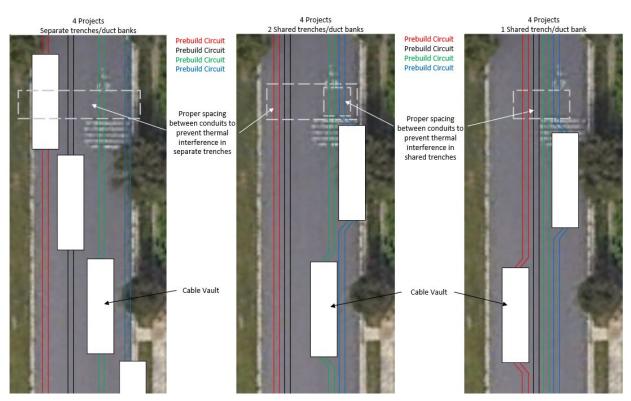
Illustrative Example of Duct Bank and Cable Vault Layout for a ROW Section
